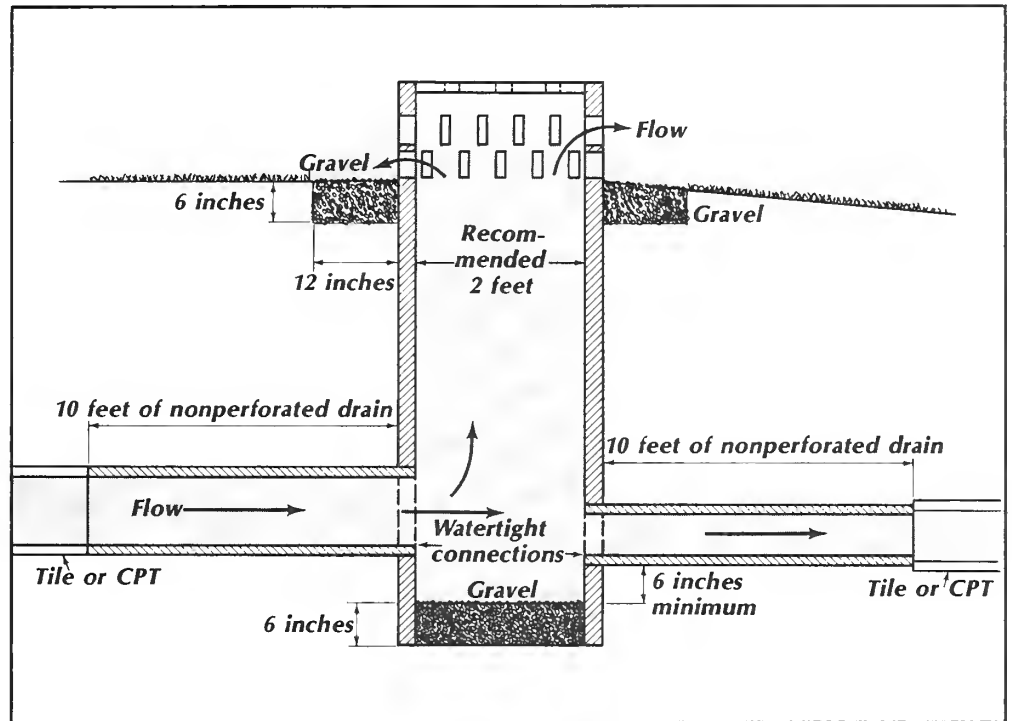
Relief wells relieve pressure in drain lines. They are typically used where tile outlet terrace systems connect to drainage mains.
